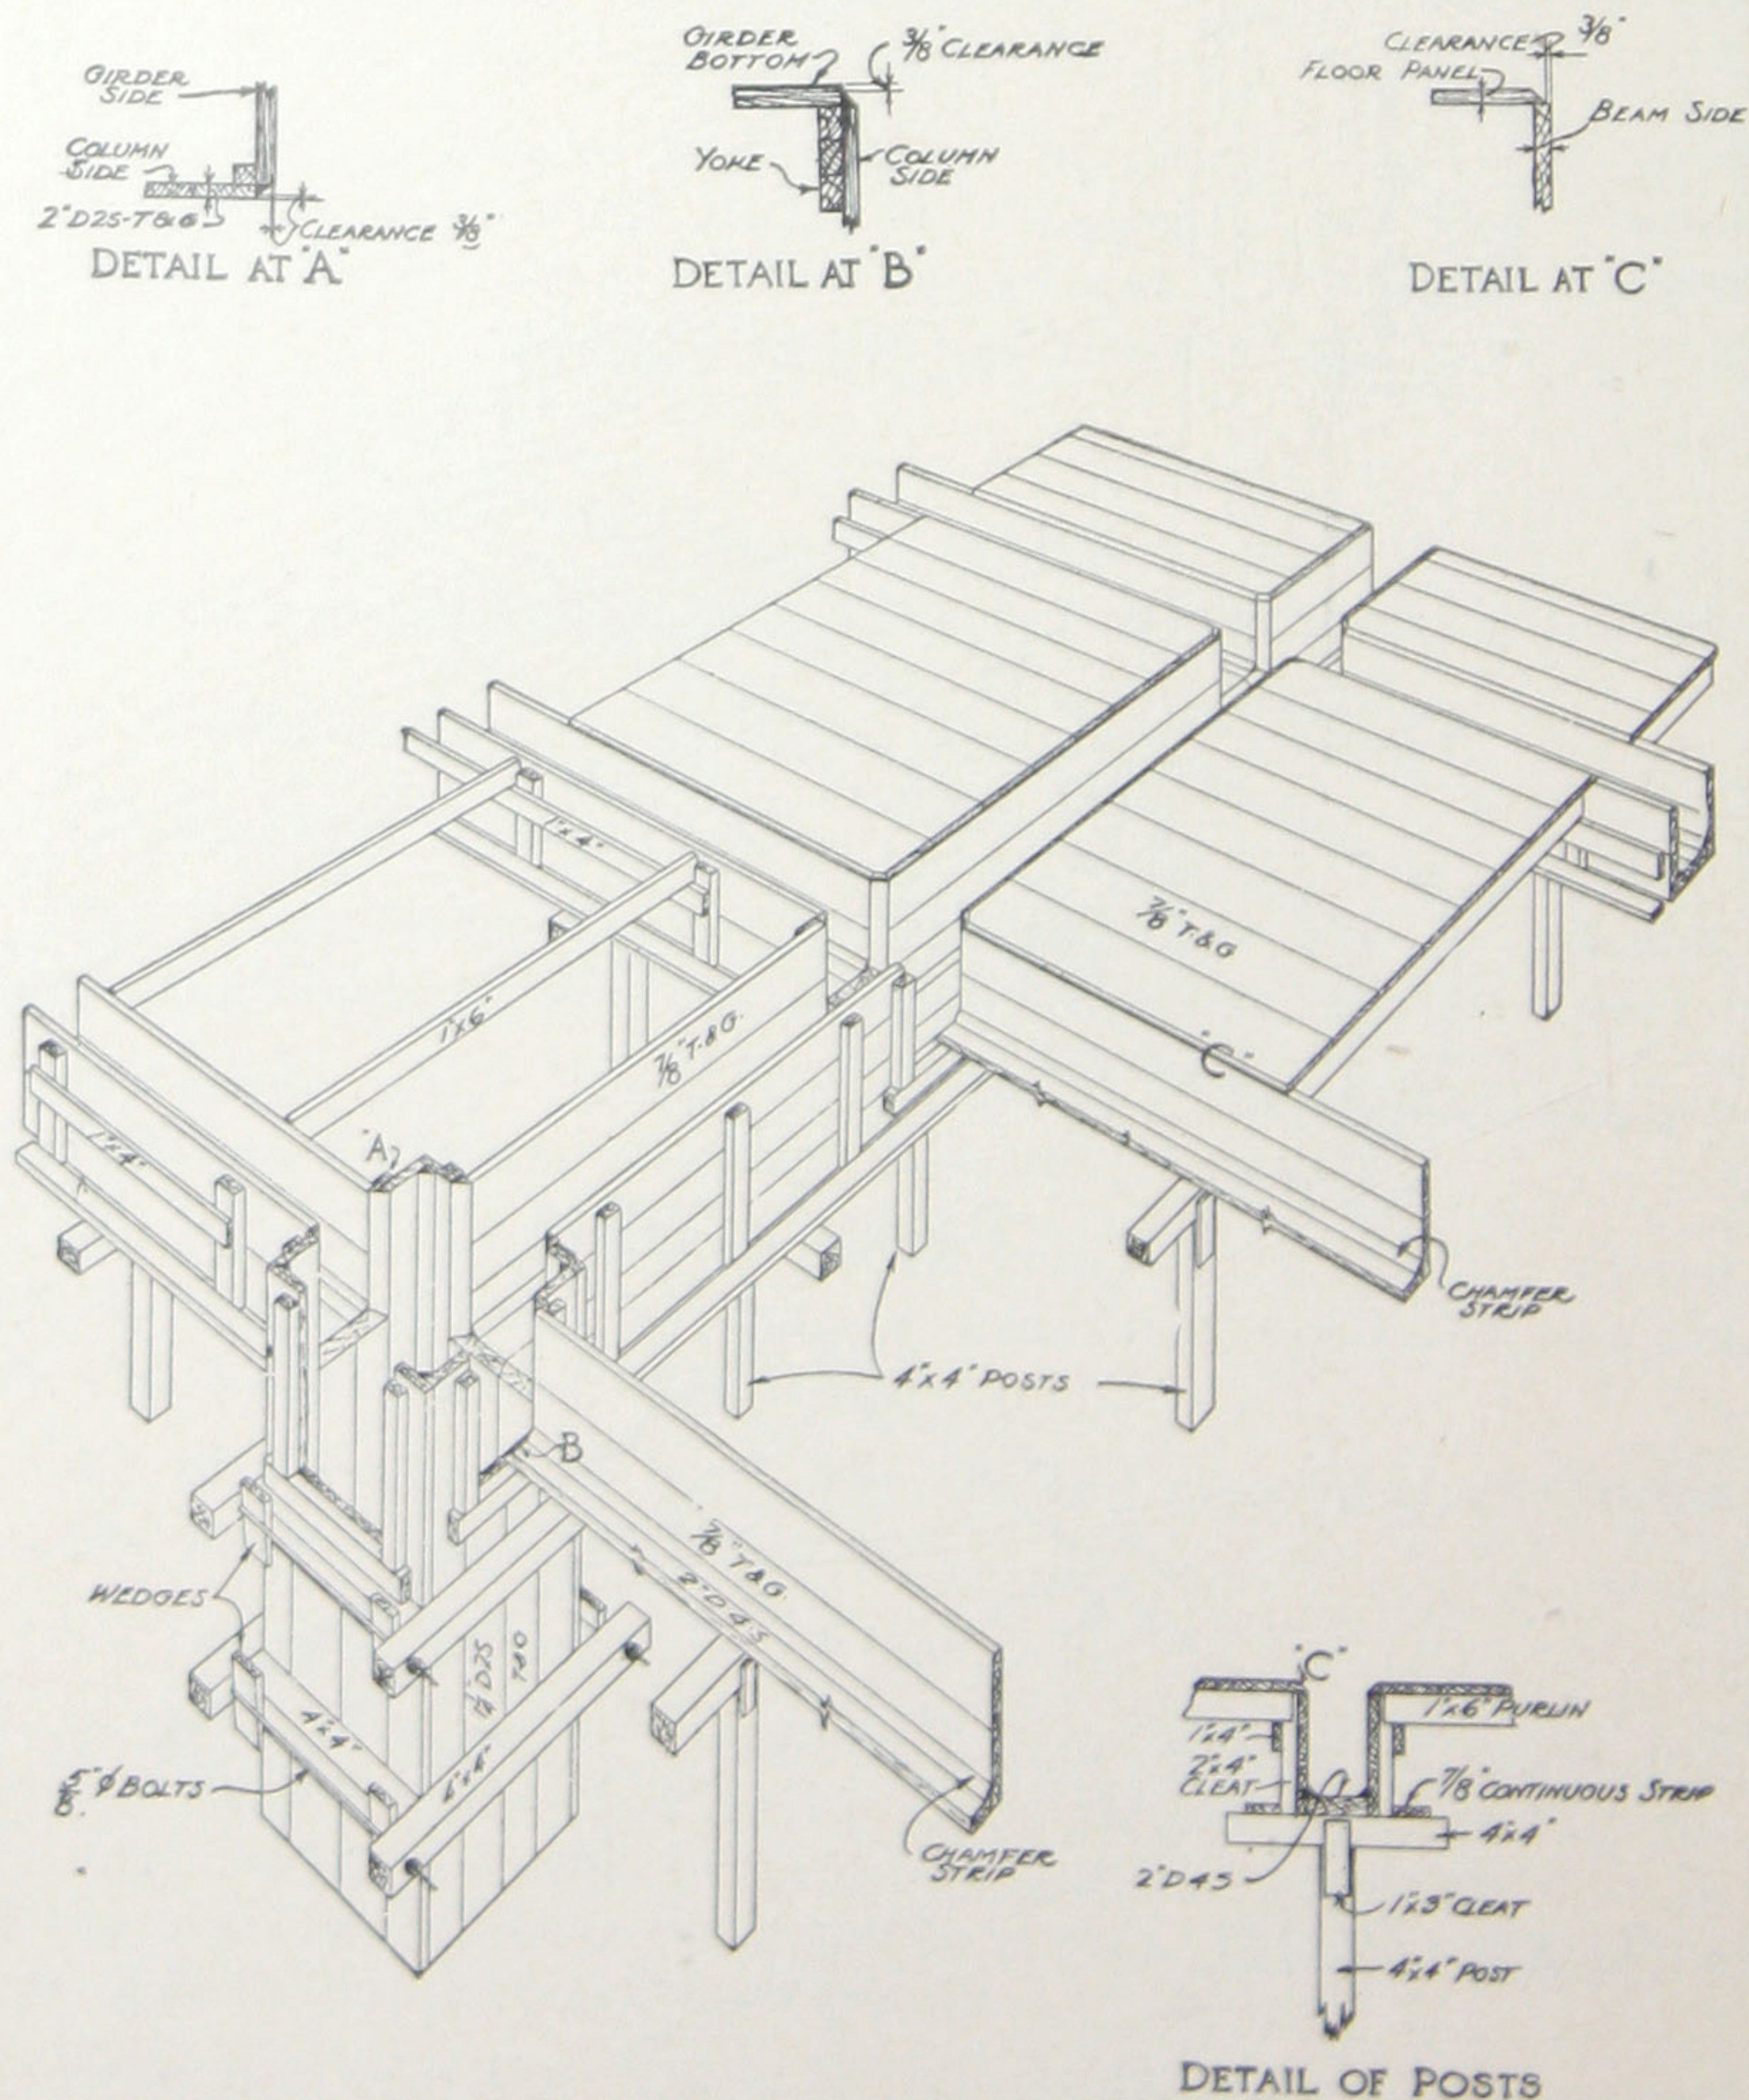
Forms for beam and girder floor assembled. See Figure 57 for details.
